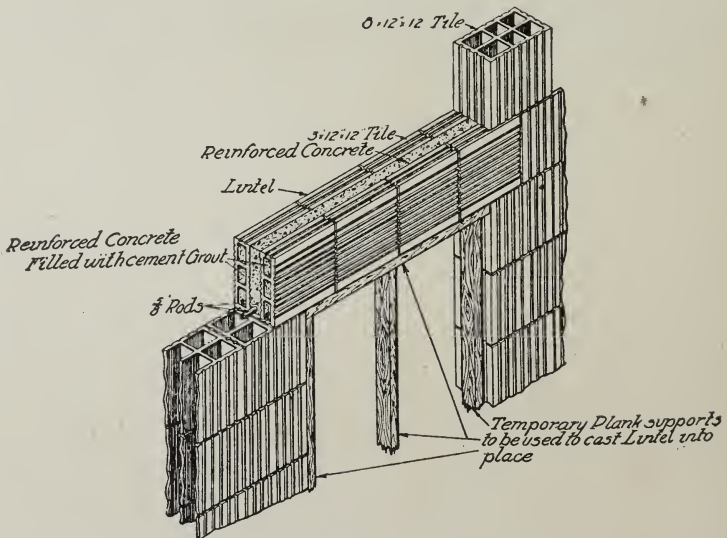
Terra-cotta Outside Wall and Lintel Construction.
